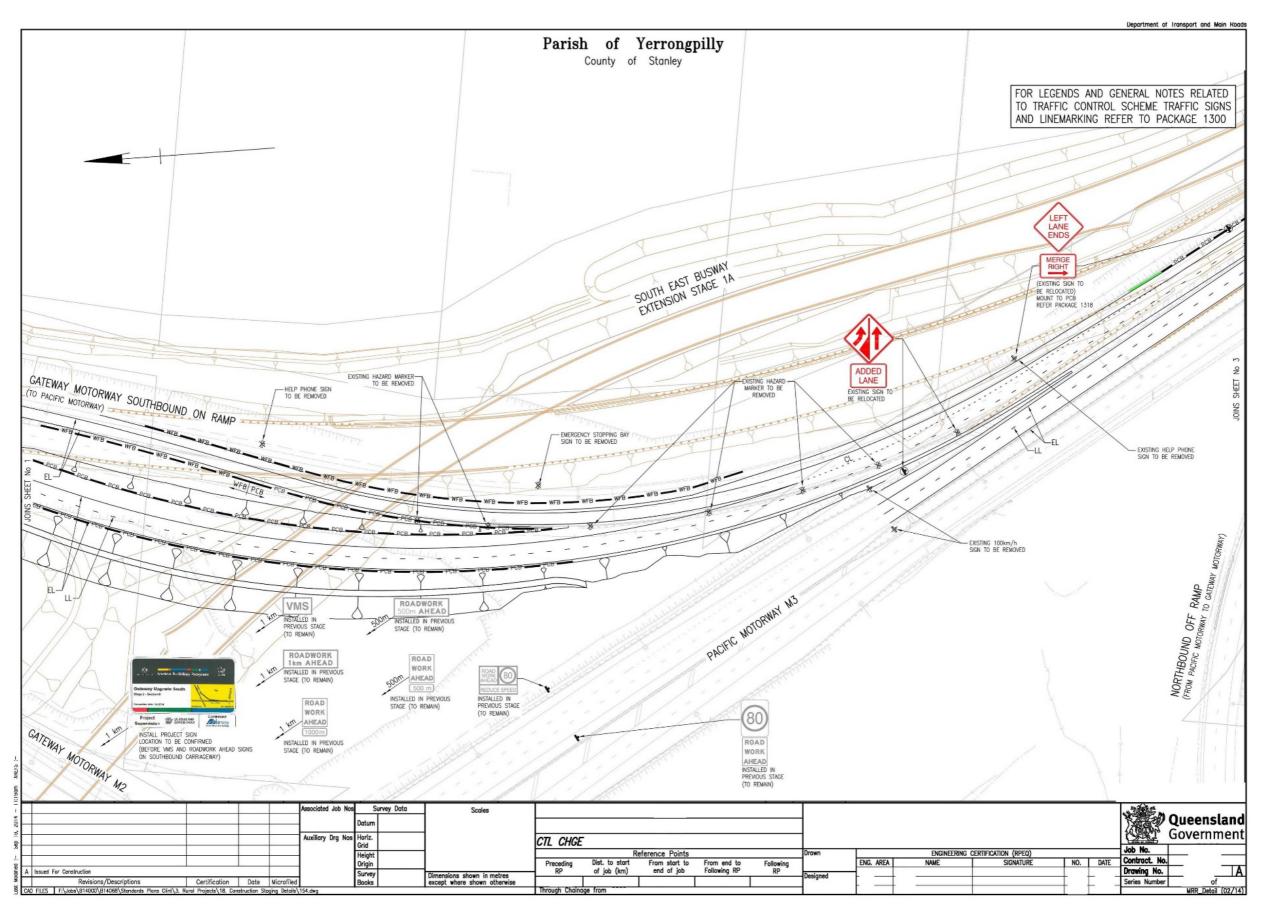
(e) – Construction staging – generic example 3 – sheet 1 of 2
